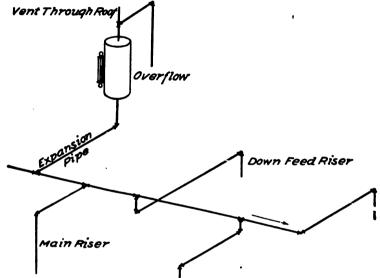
Showing the Mains and Branches Pitched Down Towards the Risers.
